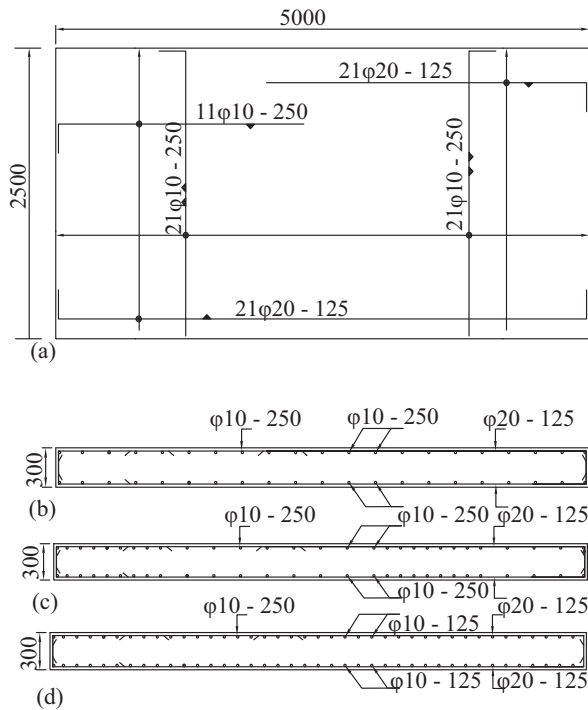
Reinforcement layout of slabs with line supports: (a) plan view of S1 and S2, (b) section of S1 and S2, (c) section of S4, (d) section of S3, S5-S10, in [mm]
